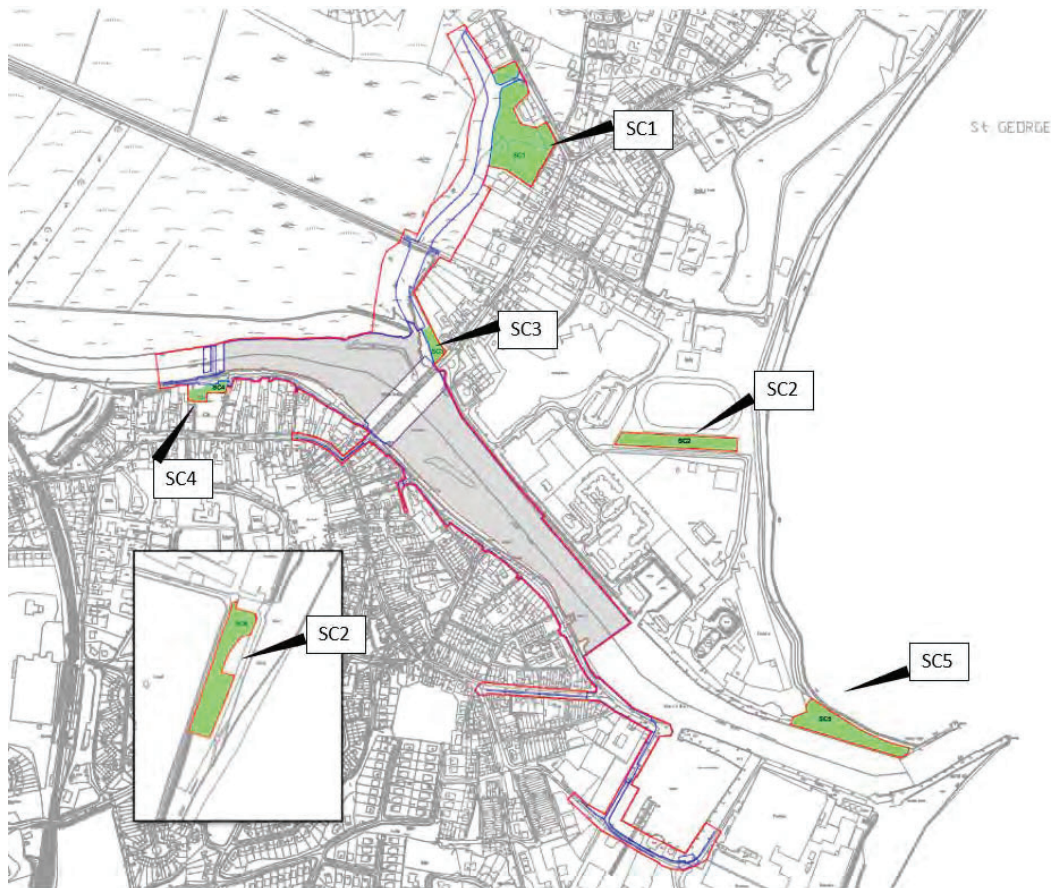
Construction Compounds (indicated in green. Not to scale. Extracted from Drawing No 1065
